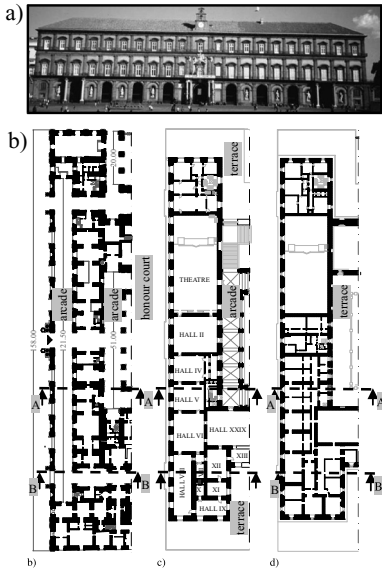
The north-west part: a) Main façade facing on Plebiscito square; b) Ground floor; c) First floor; d) Second floor.
